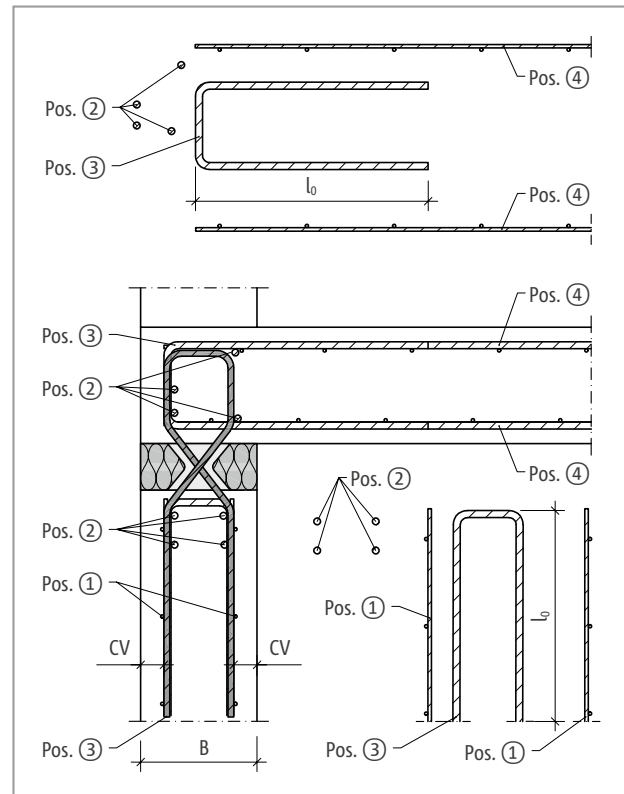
Schöck Sconnex® type W-N-VH: Variant B – on-site reinforcement for connection to top of wall
